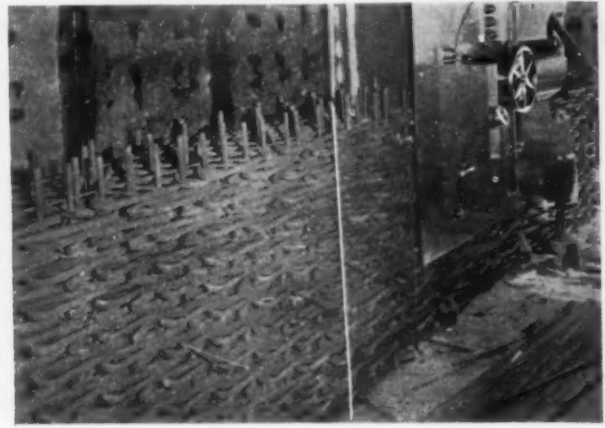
Reinforcing Frames of Bent Bars At Angles to Face of Wall
